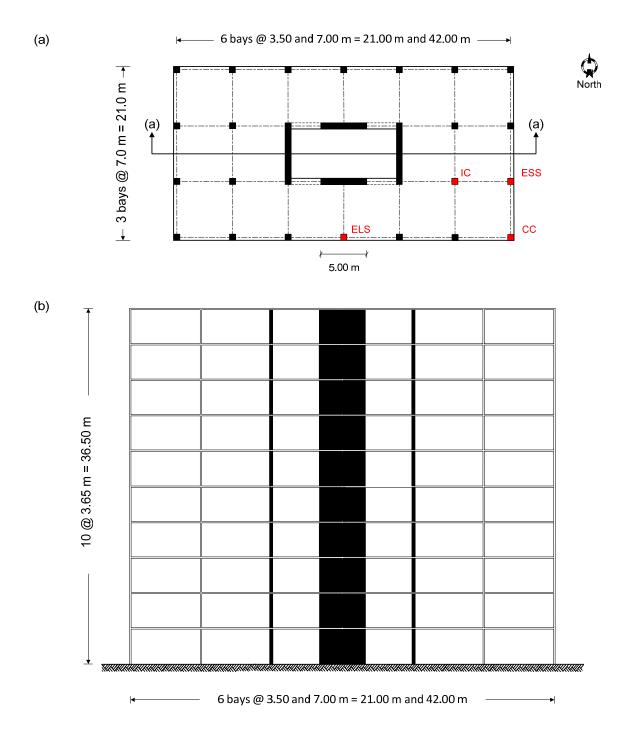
(a) Plan of floors and (b) cross section (a-a) of the building.
